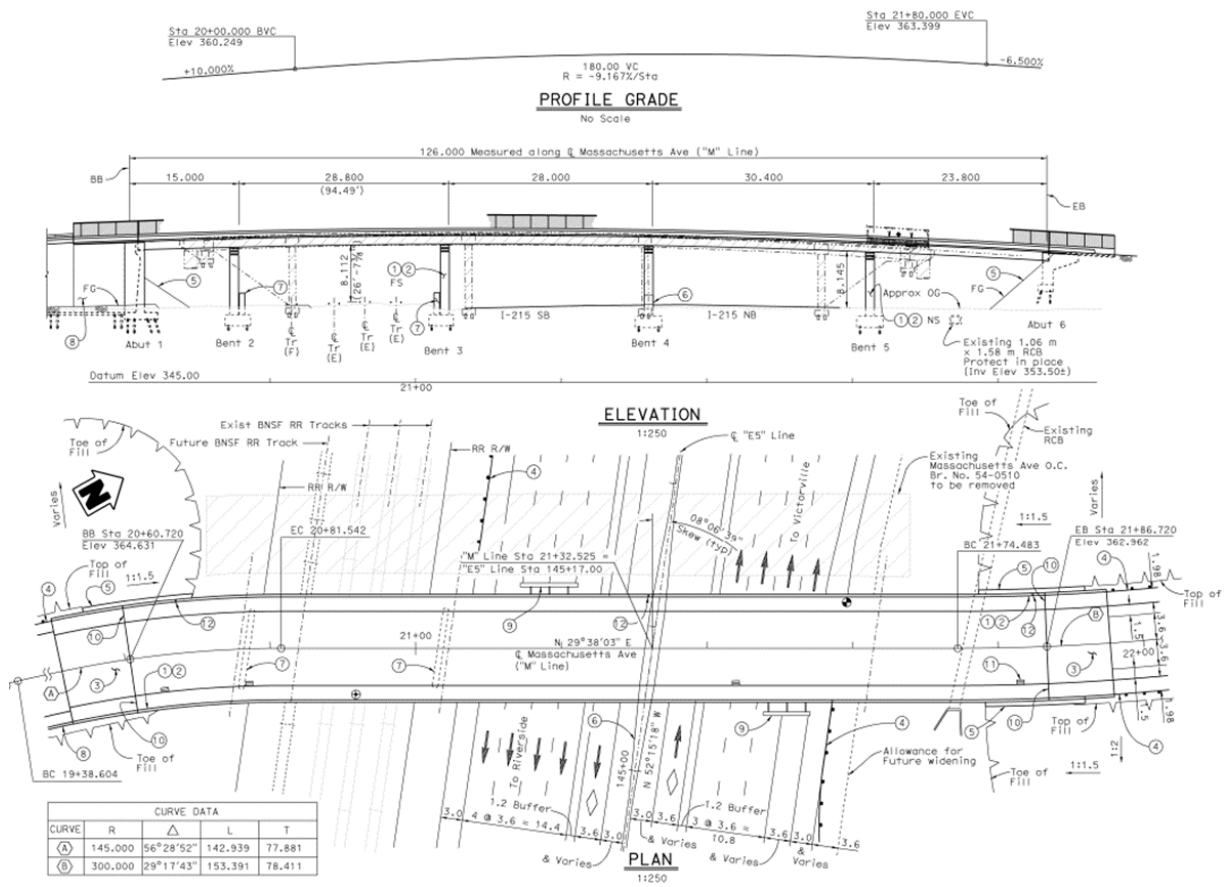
Elevation and plan views of the MAOC bridge (source: Caltrans structural drawings).
